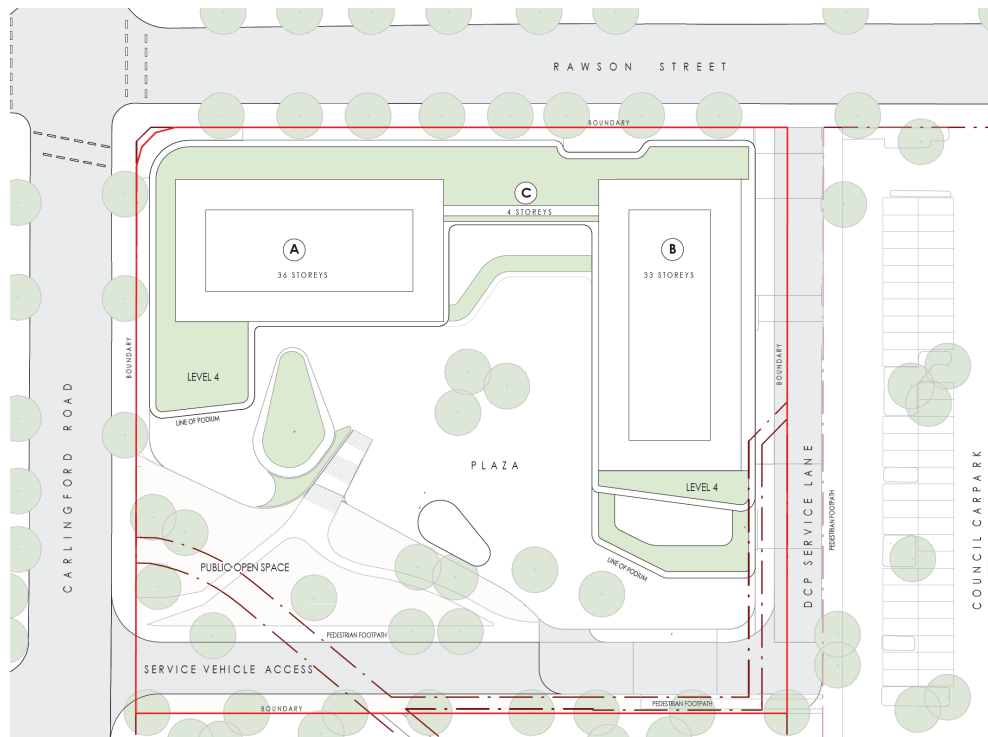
Indicative Site Layout (Tower A = 36 storeys, Tower B = 33 storeys, Podium C = 4-5 storeys)
